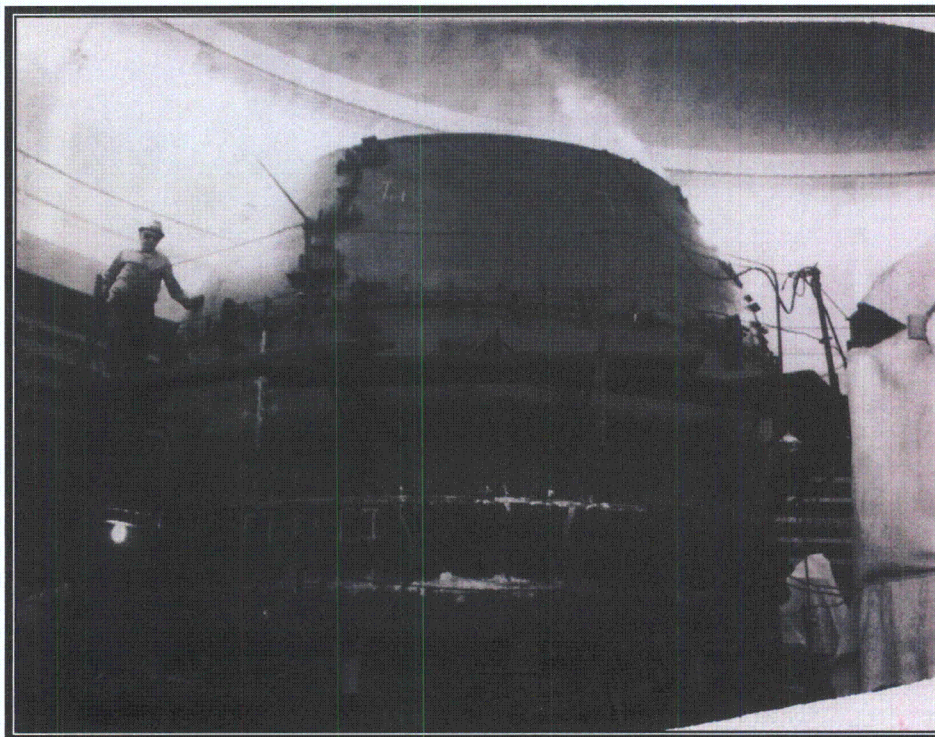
Construction of machinery dome inside containment building (Courtesy DECo)
